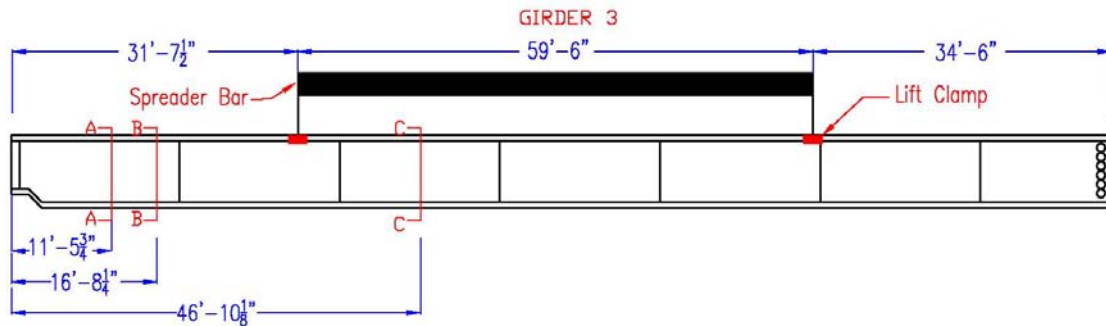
Girder 3 Lift Locations w/ Gaged Sections
